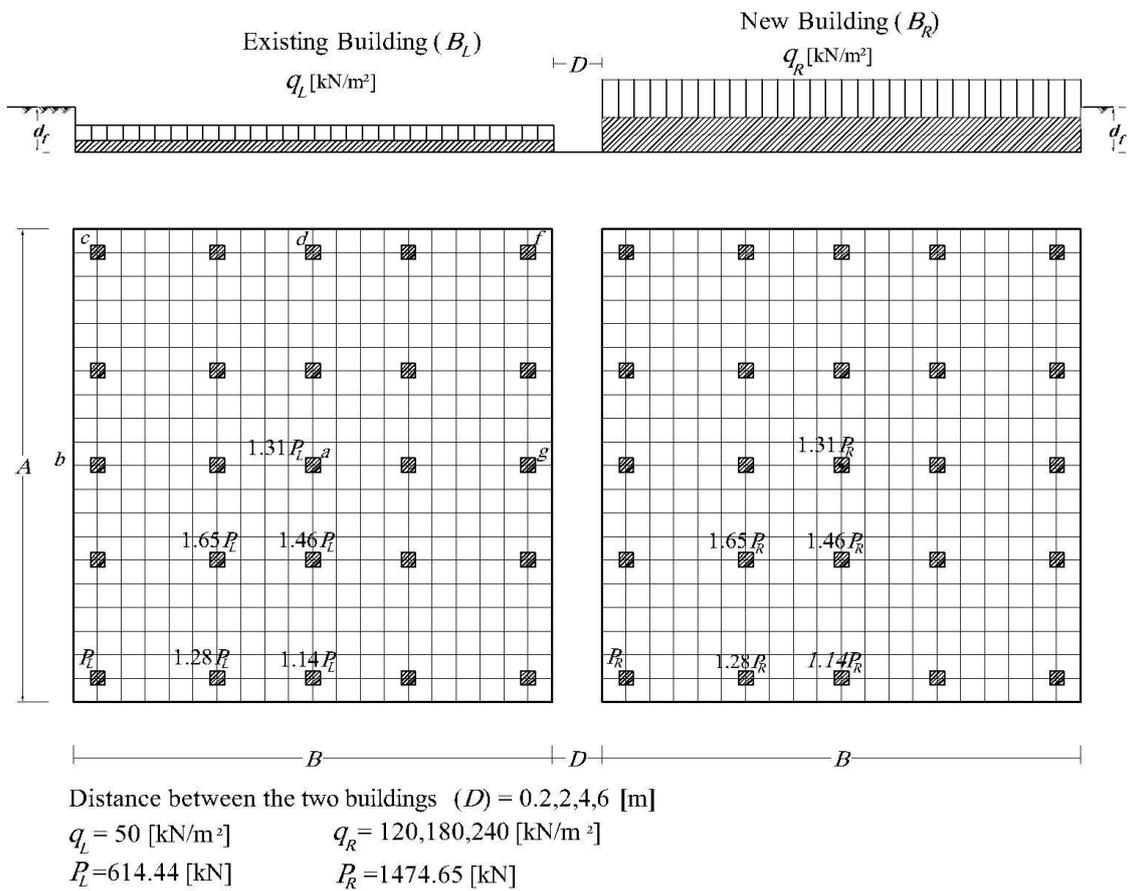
Rafts geometry and loads for buildings B_R and B_L
